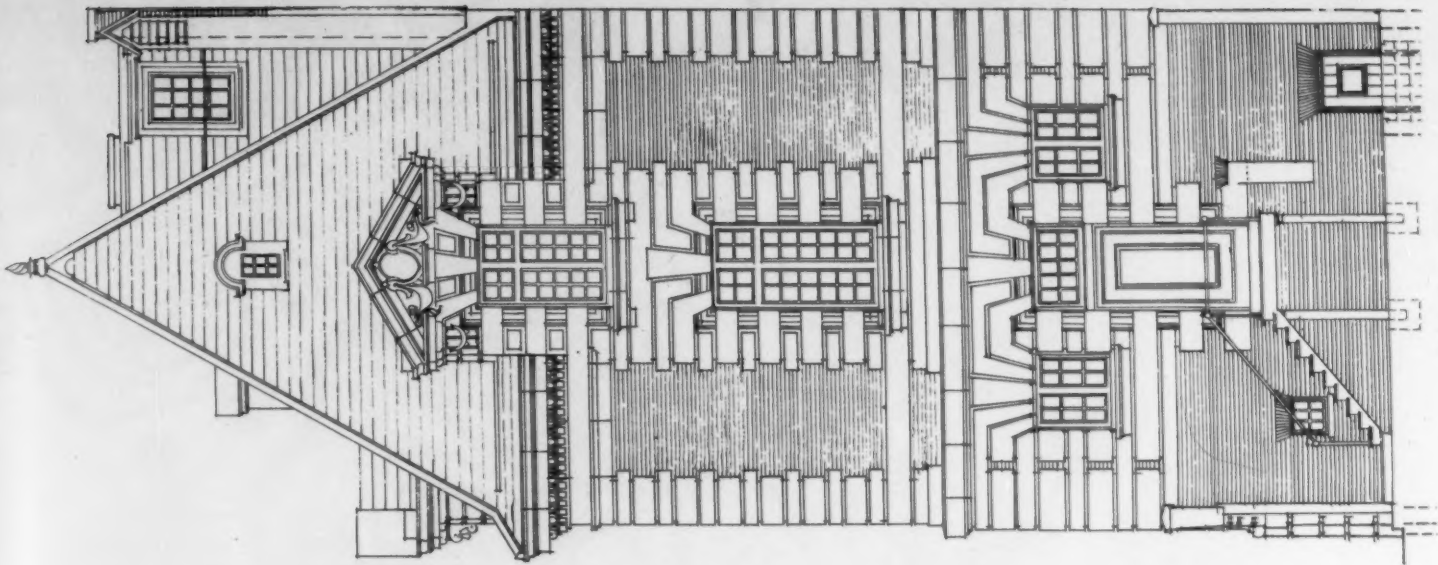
AND 4TH STORIES, HALL OF THE BOARD OF EDUCATION, NEW YORK CITY.
